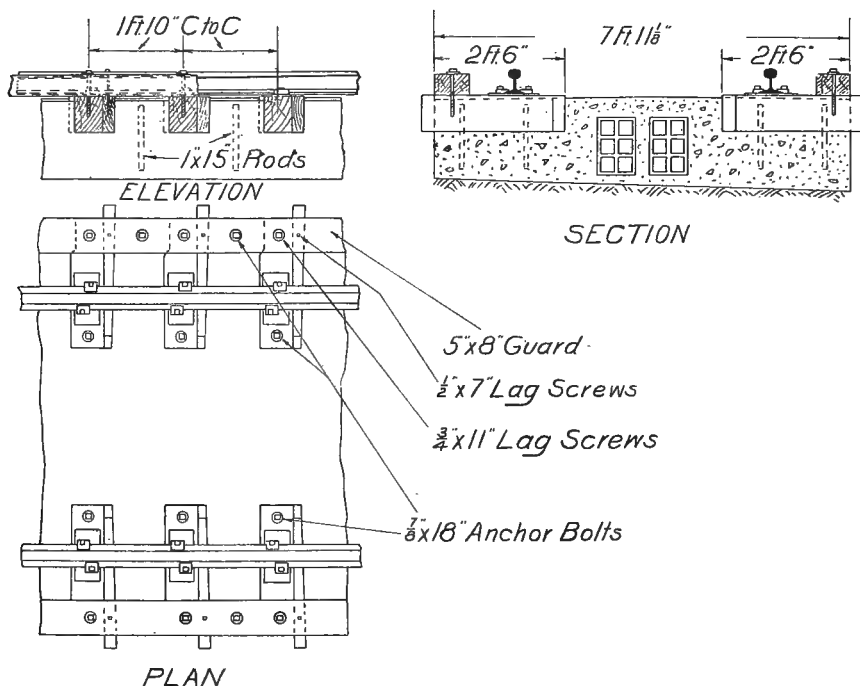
CONCRETE ROADBED, NEW BERGEN HILL TUNNEL.
